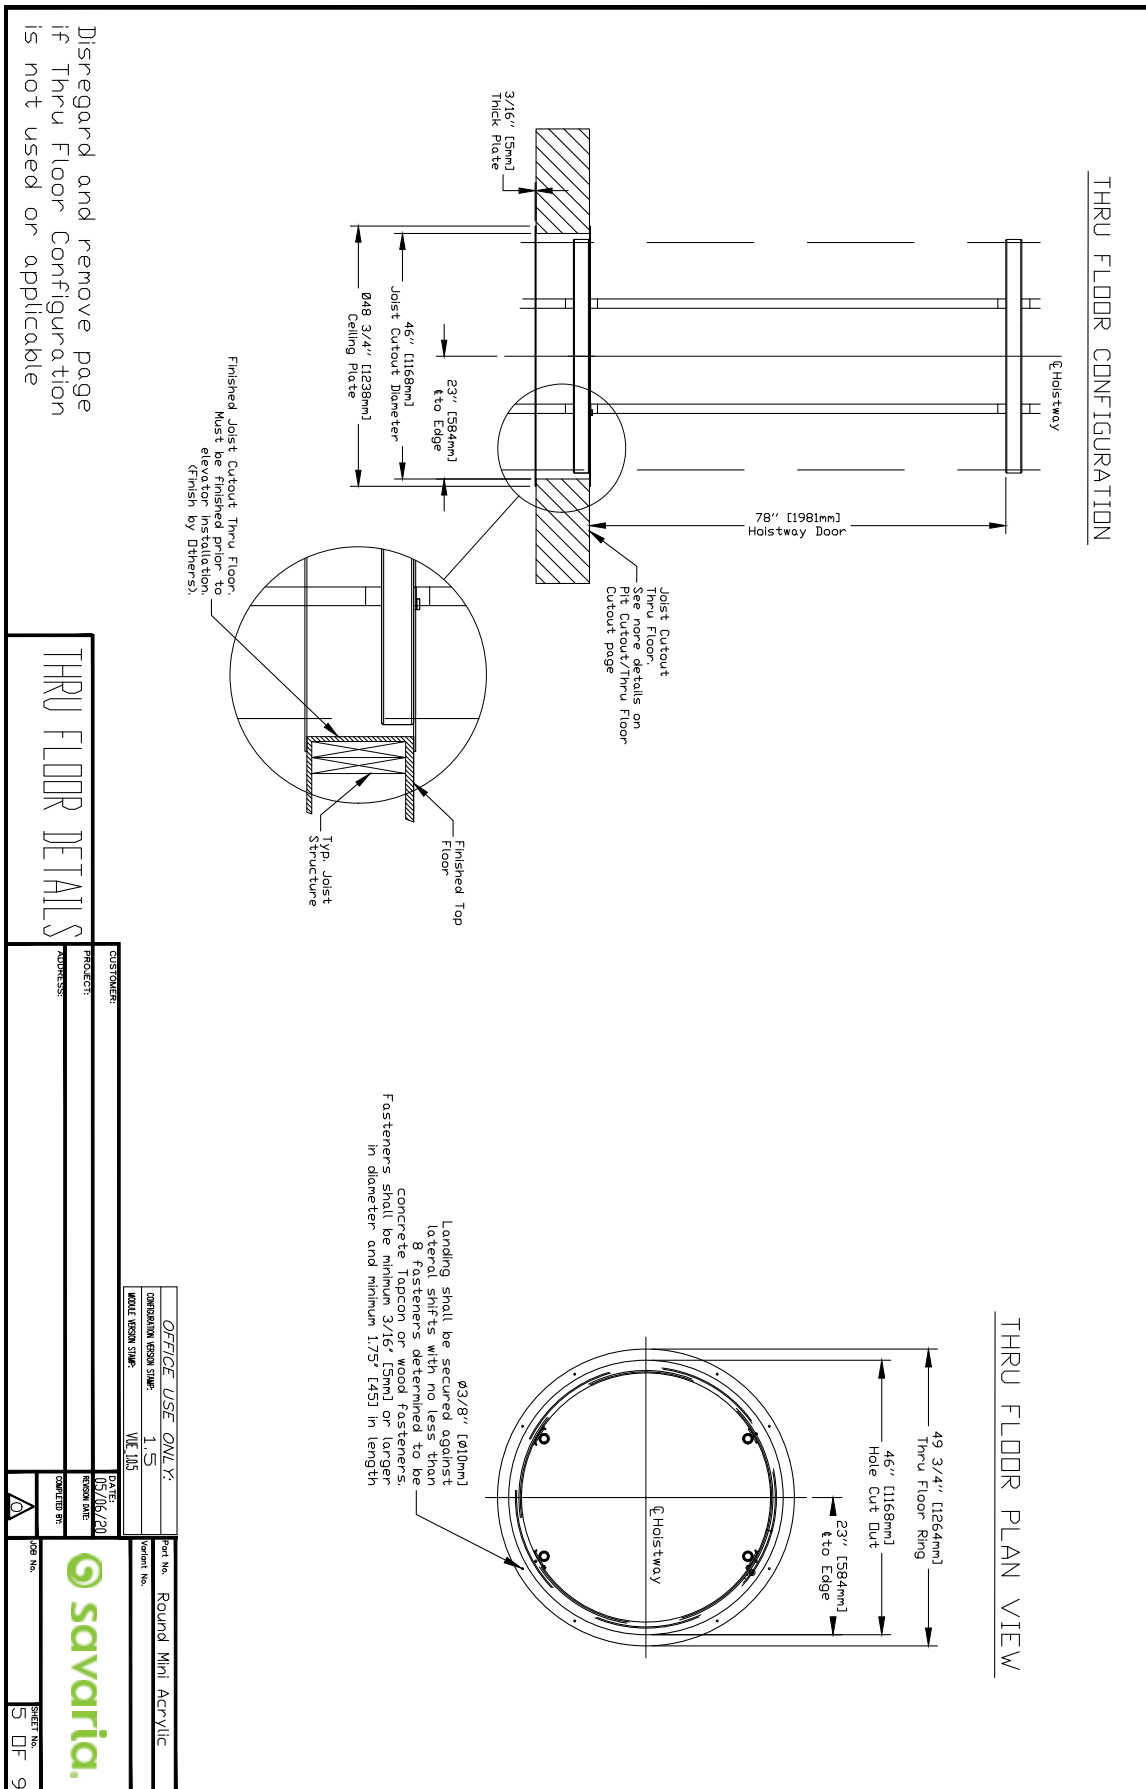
Thru floor details (acrylic/glass) - type 1 or 2
